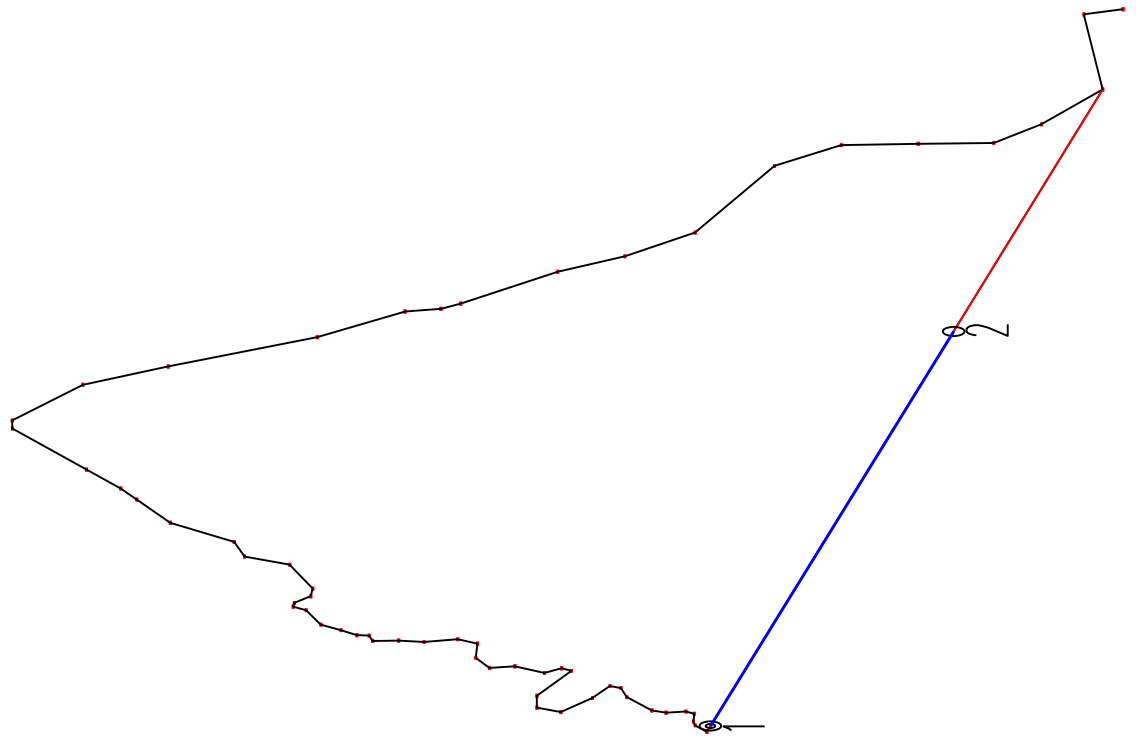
1 Horizontal layout and Entoto Tunnel Road Portal from hand GPS data of existing surface road
